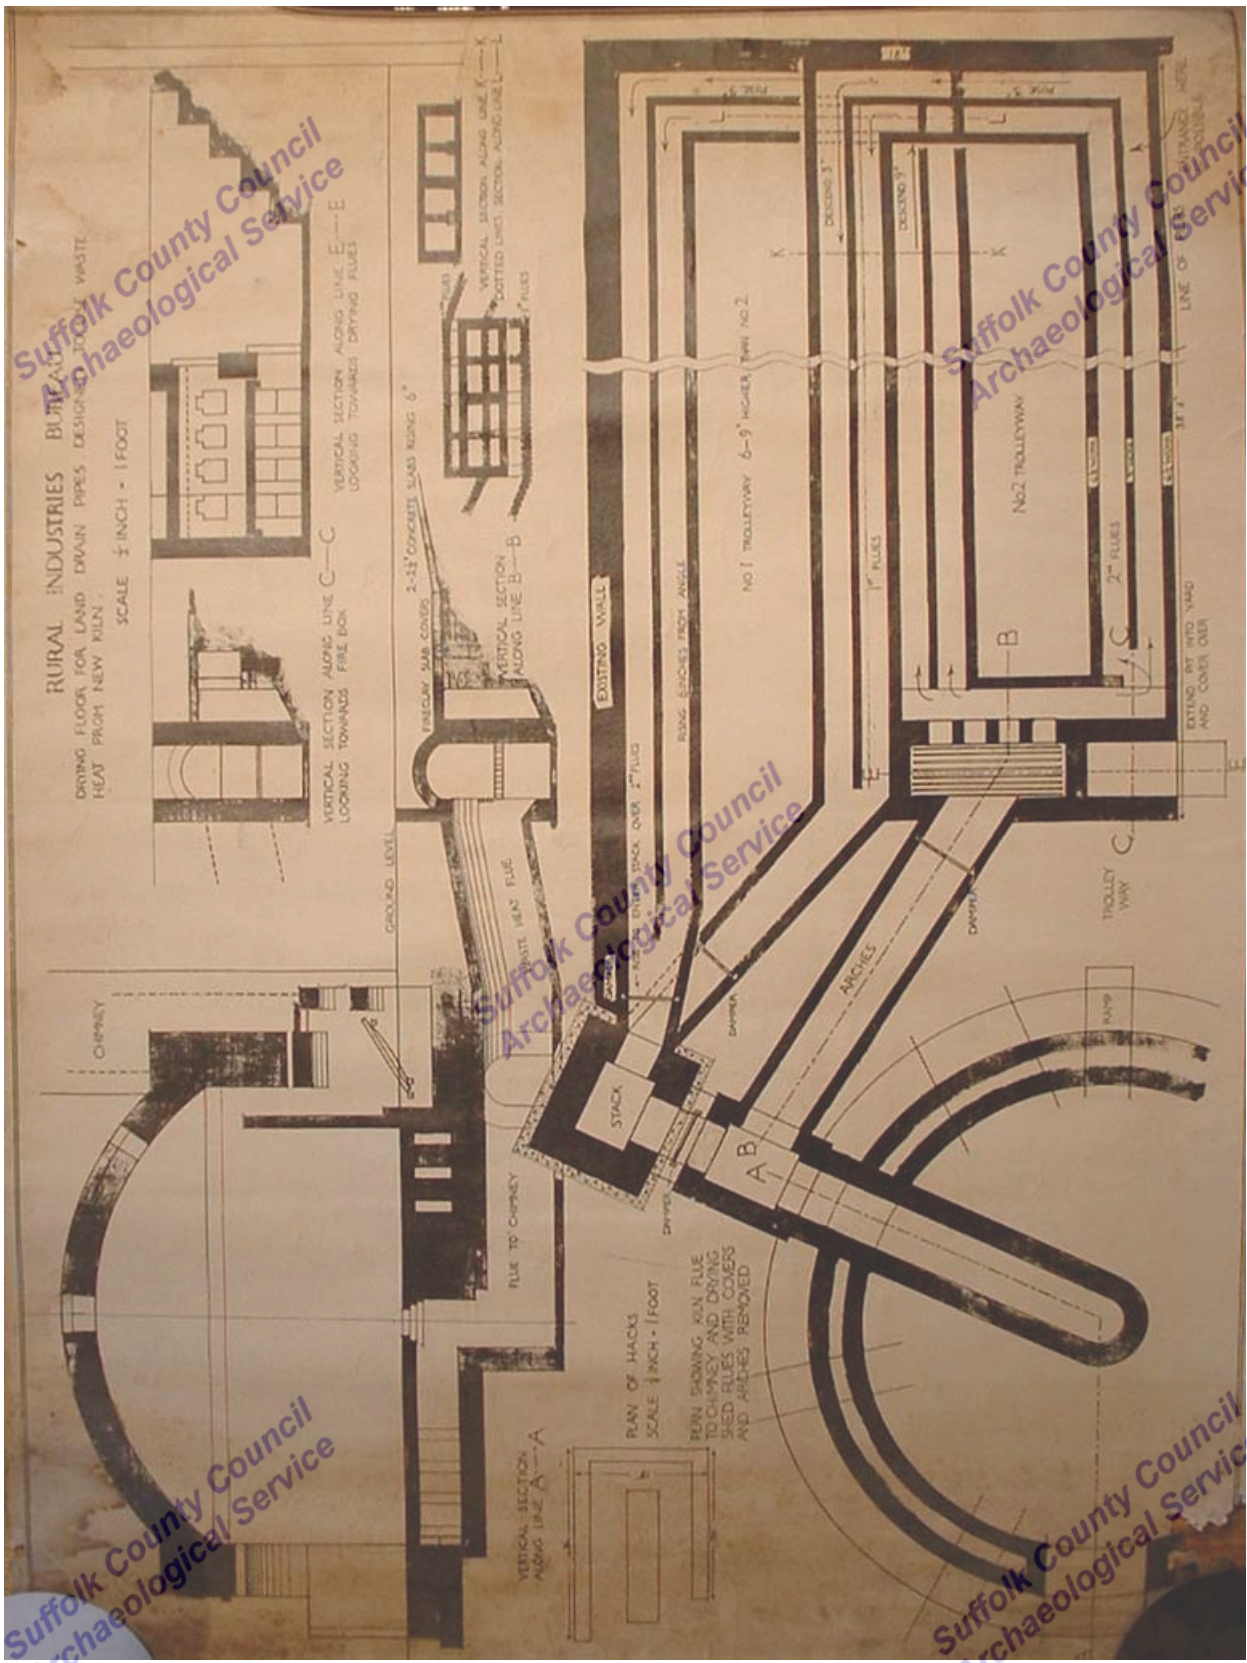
Architects plan of the 1940/41 up-draught kiln and associated drying floor.
